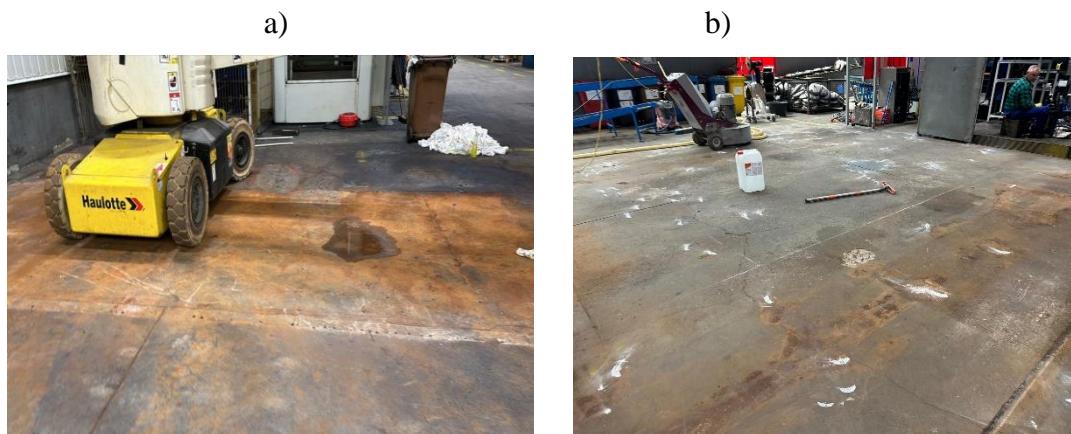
Concrete industrial floor (Example 1) before repair: a), b) after removal of steel plates, visible rust mashing and discoloration on the upper surface of the floor
